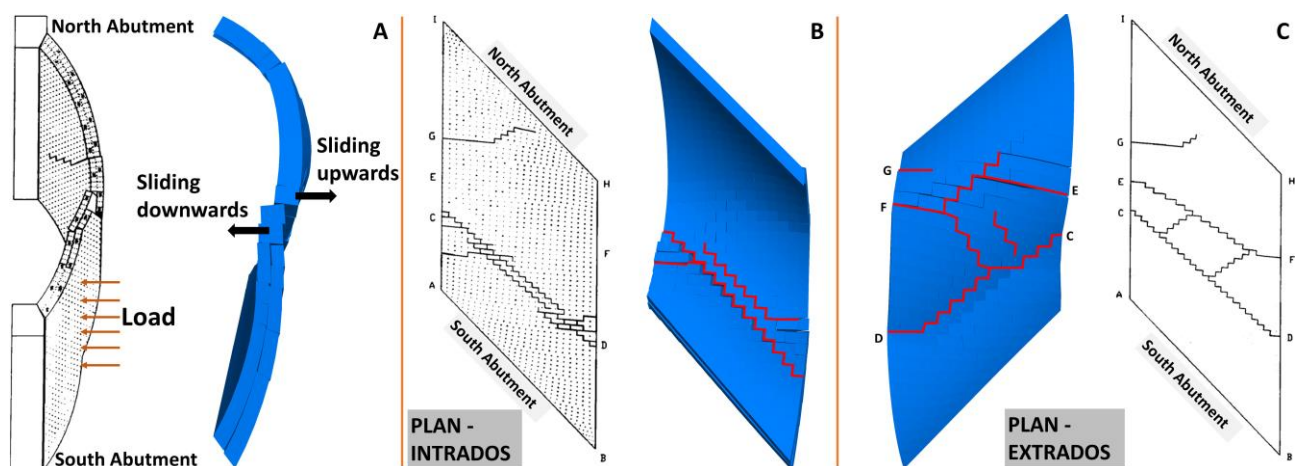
Double layer (3 m span) skew masonry arch barrel (Experimental and numerical damage states)
